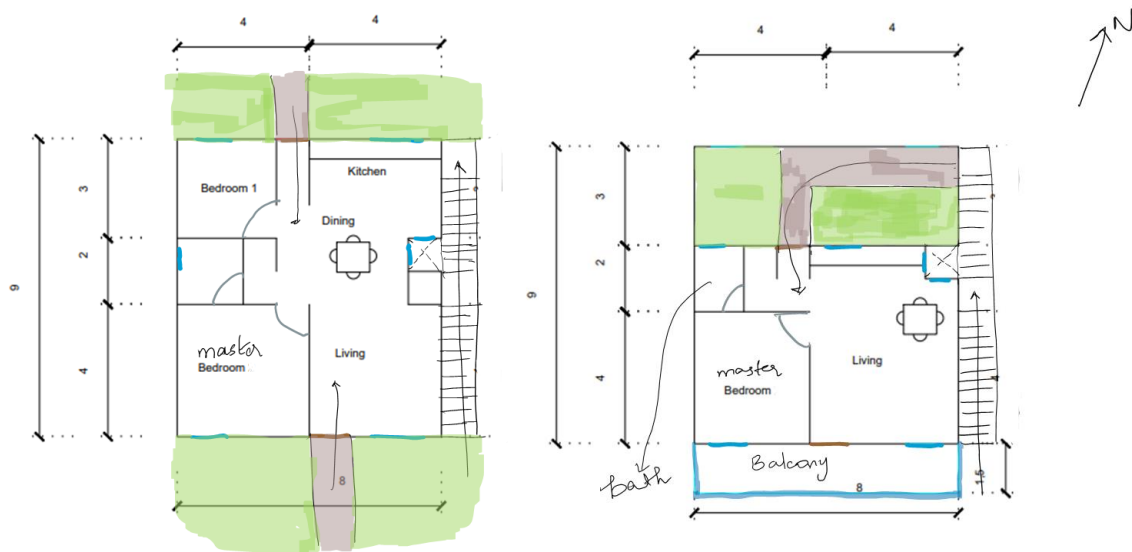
Ground floor plan - two-bedroom flat (left), first floor plan - one bedroom flat (right)
